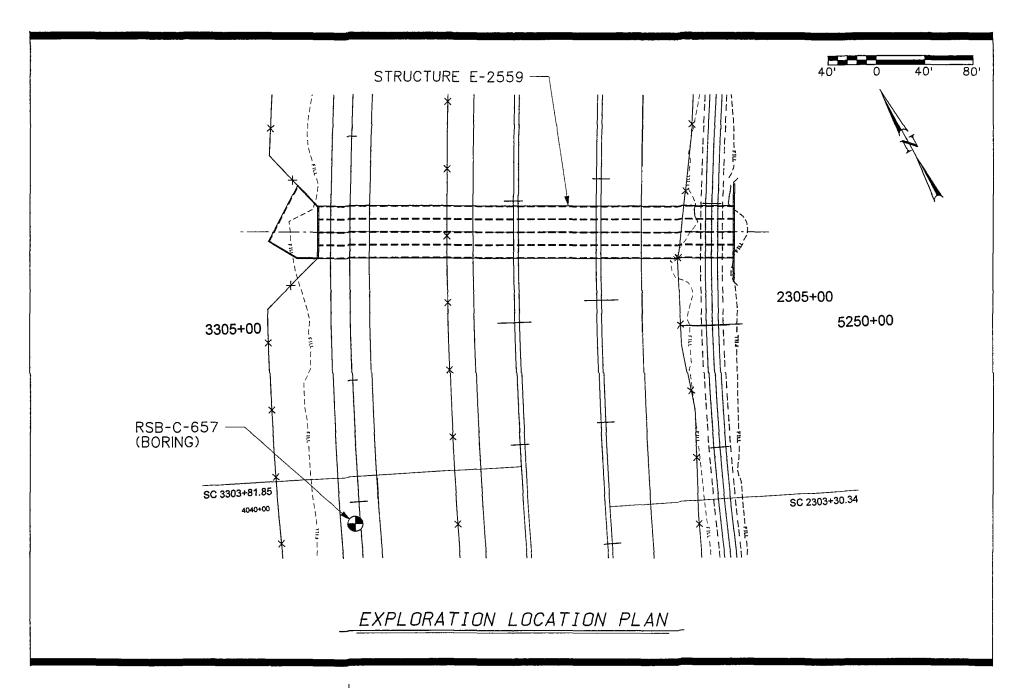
SITE PLAN & TEST HOLE LOCATIONS
